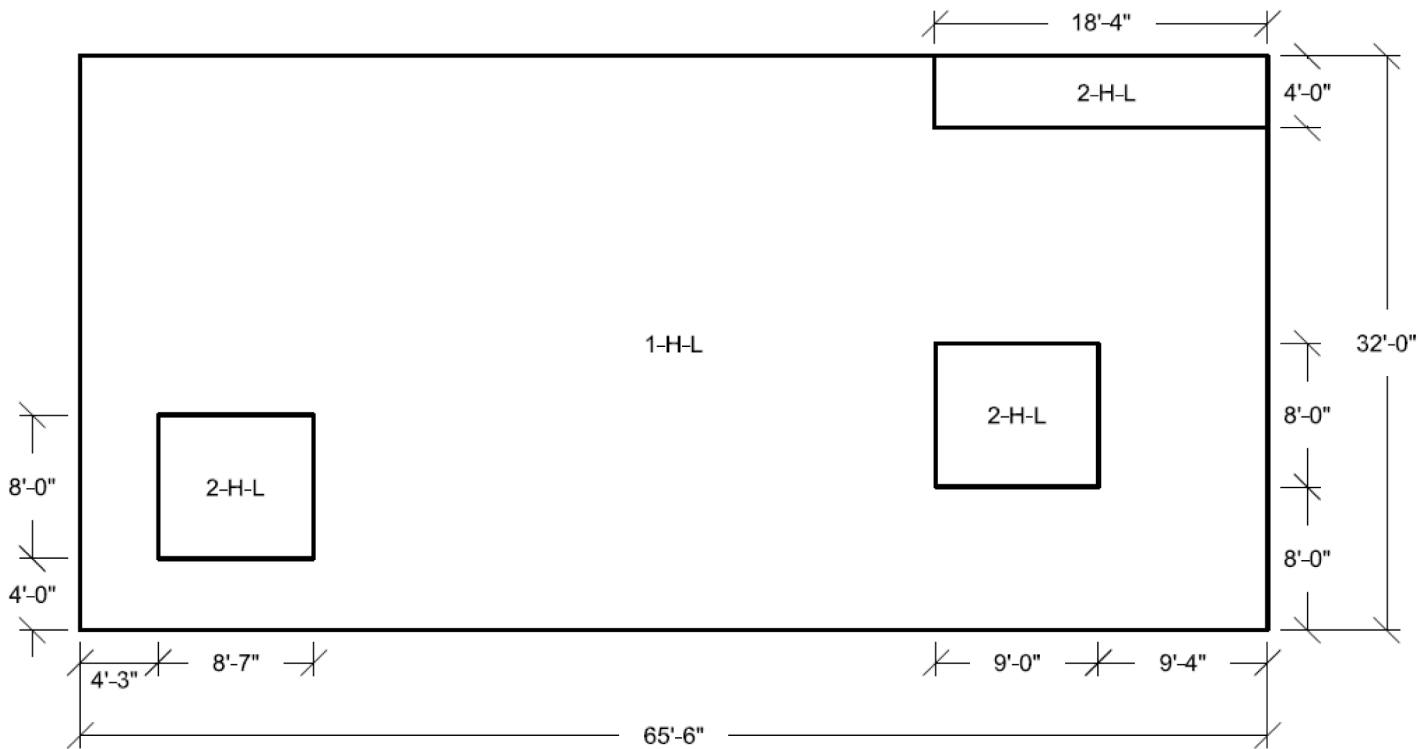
H.6-165 DGFOSV Wall 7 Looking From Outside
